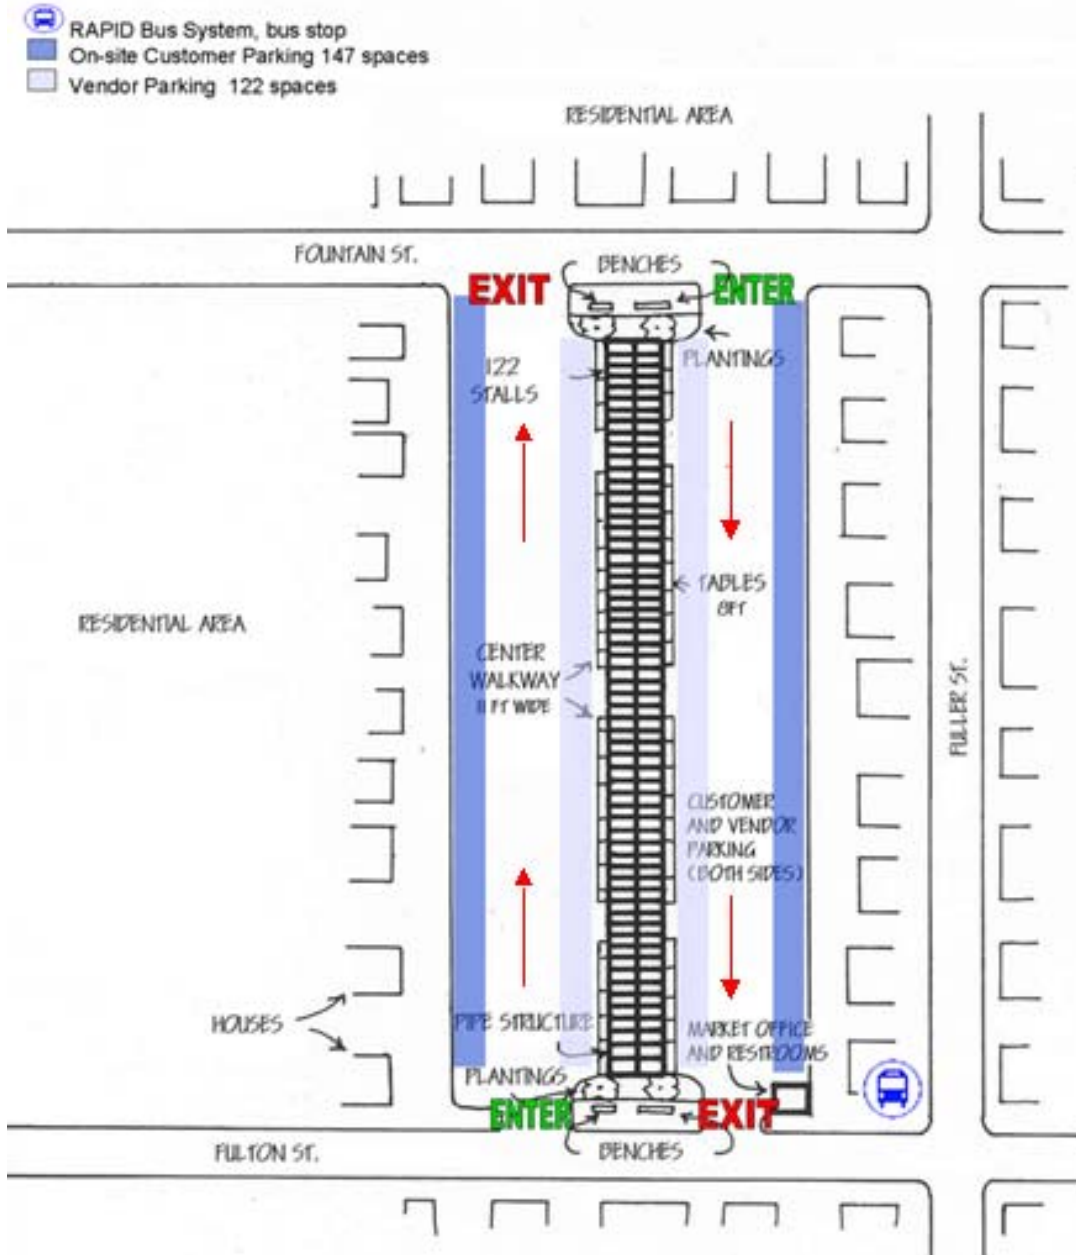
Site Plan for Fulton Street Farmers Market (CES, 1983)
